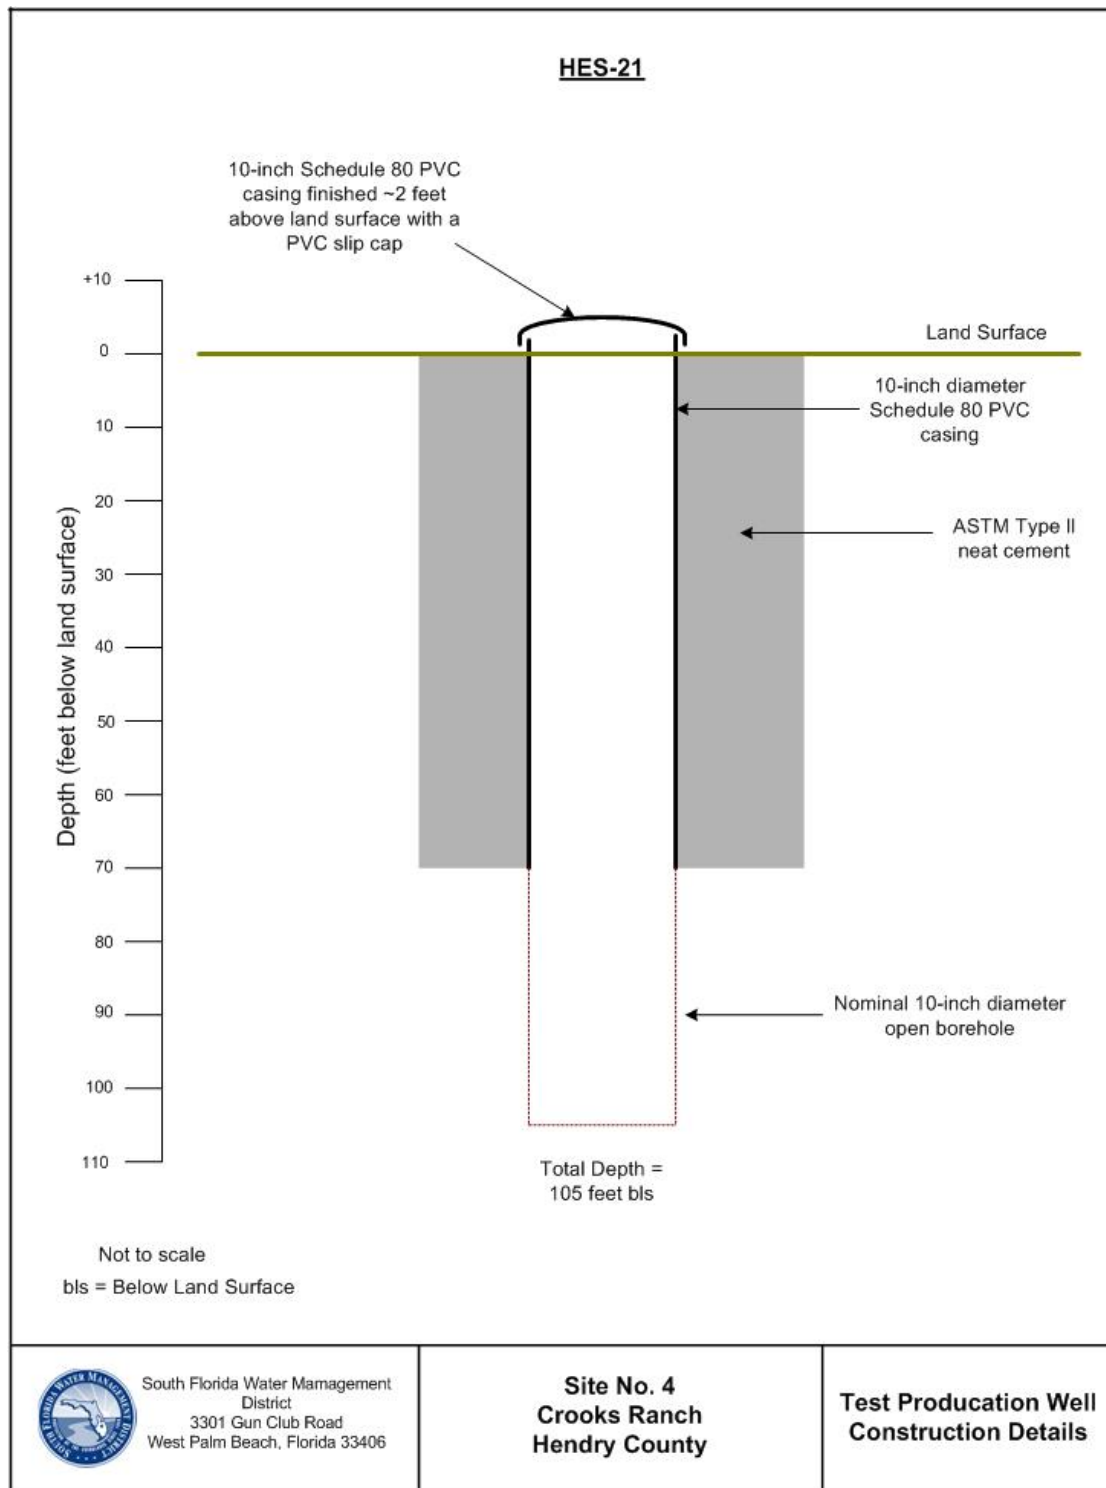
Site No. 4 APT Test Well Constructions Details.
